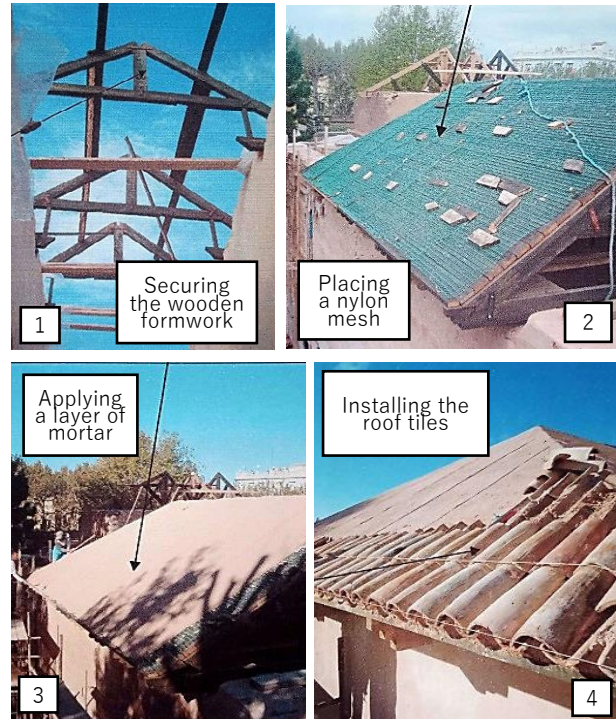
Stages of roof installation. (Source: Technical Design Office A.R.C.A.D.E. 2011).
